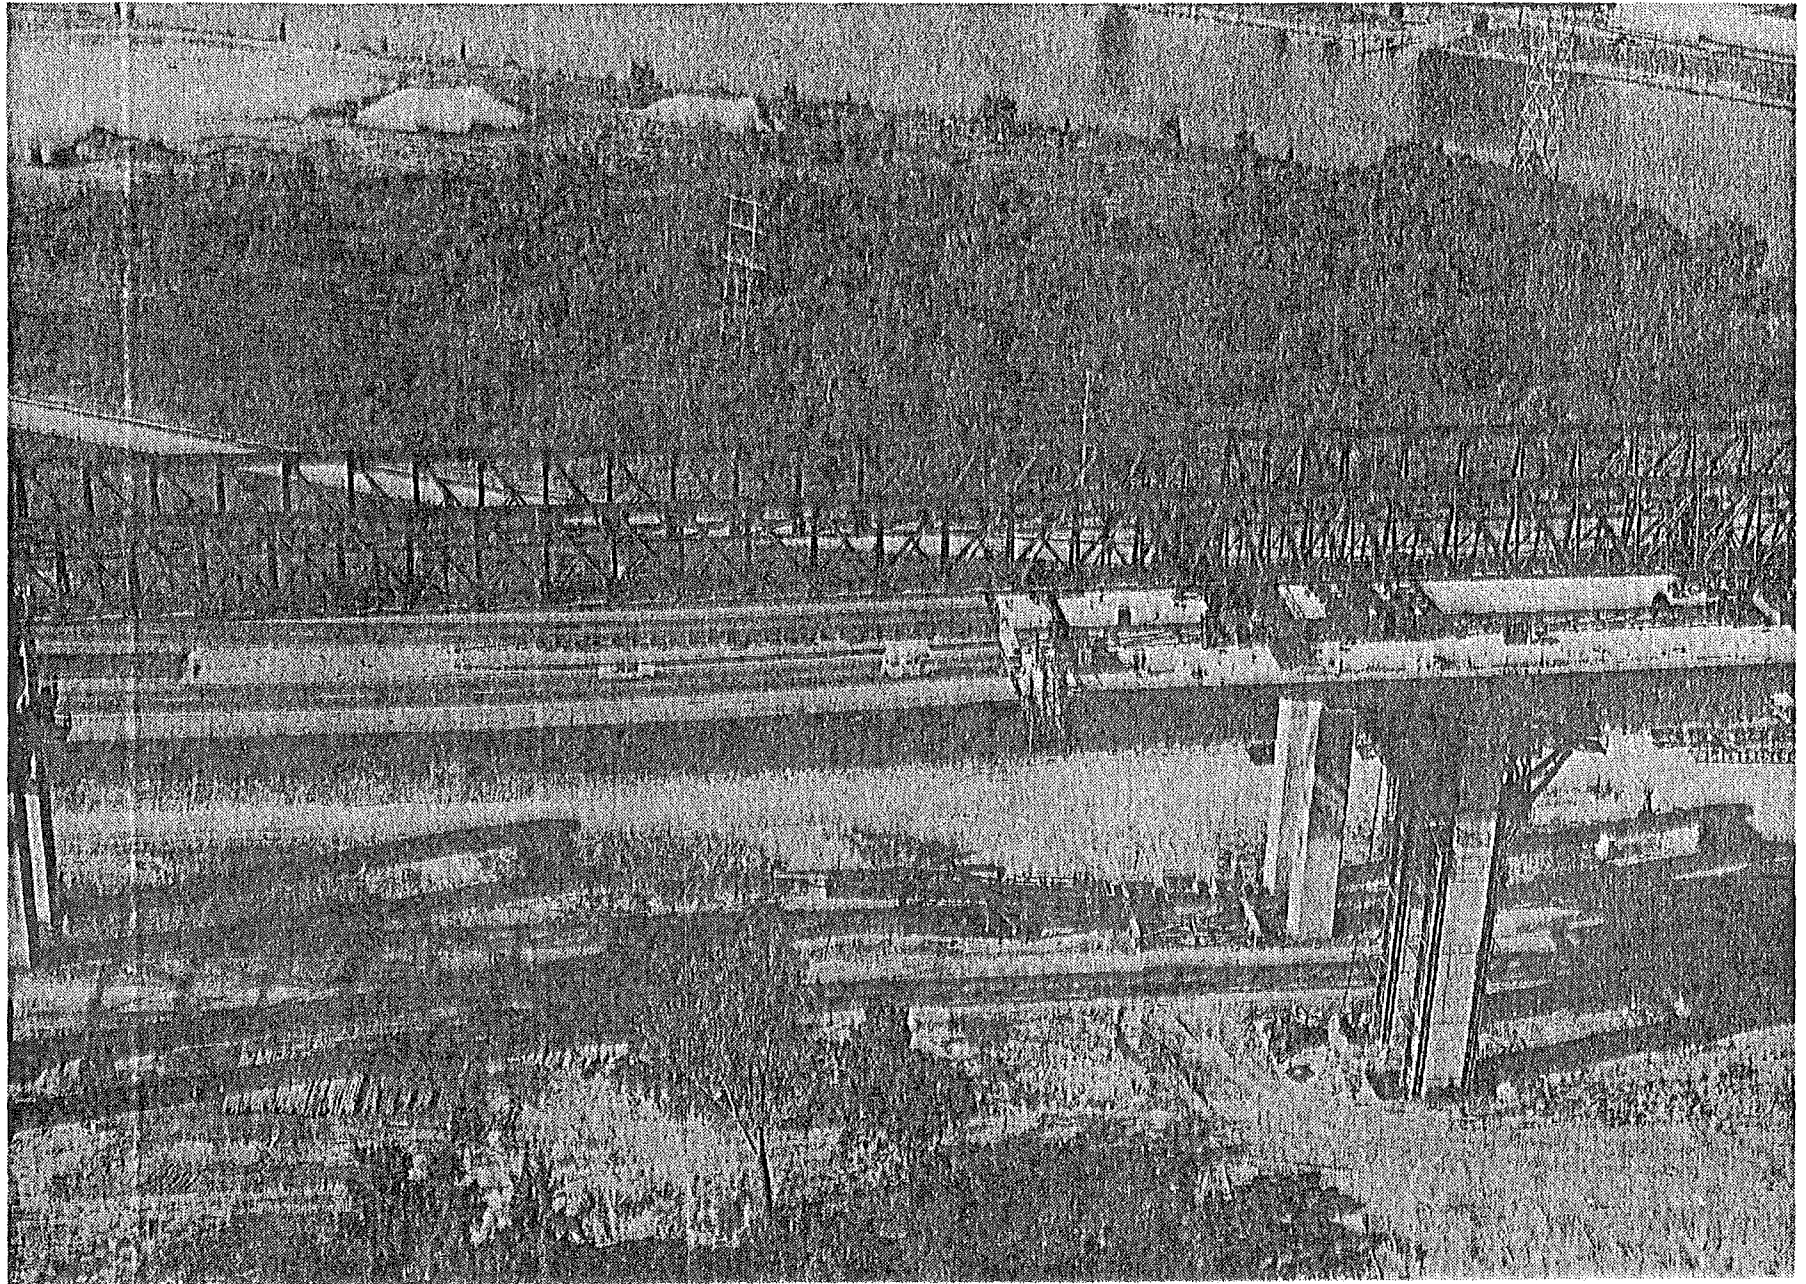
Aerial view of Launching Girder at Pier 10N
